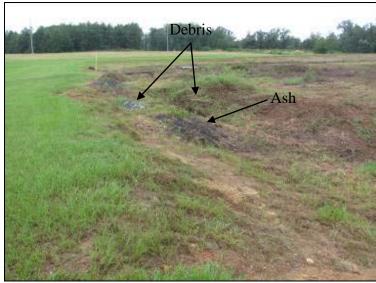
Ash Pond – Crest and interior slope southeast embankment, looking southwest. Note: Ash and debris at pond surface.
